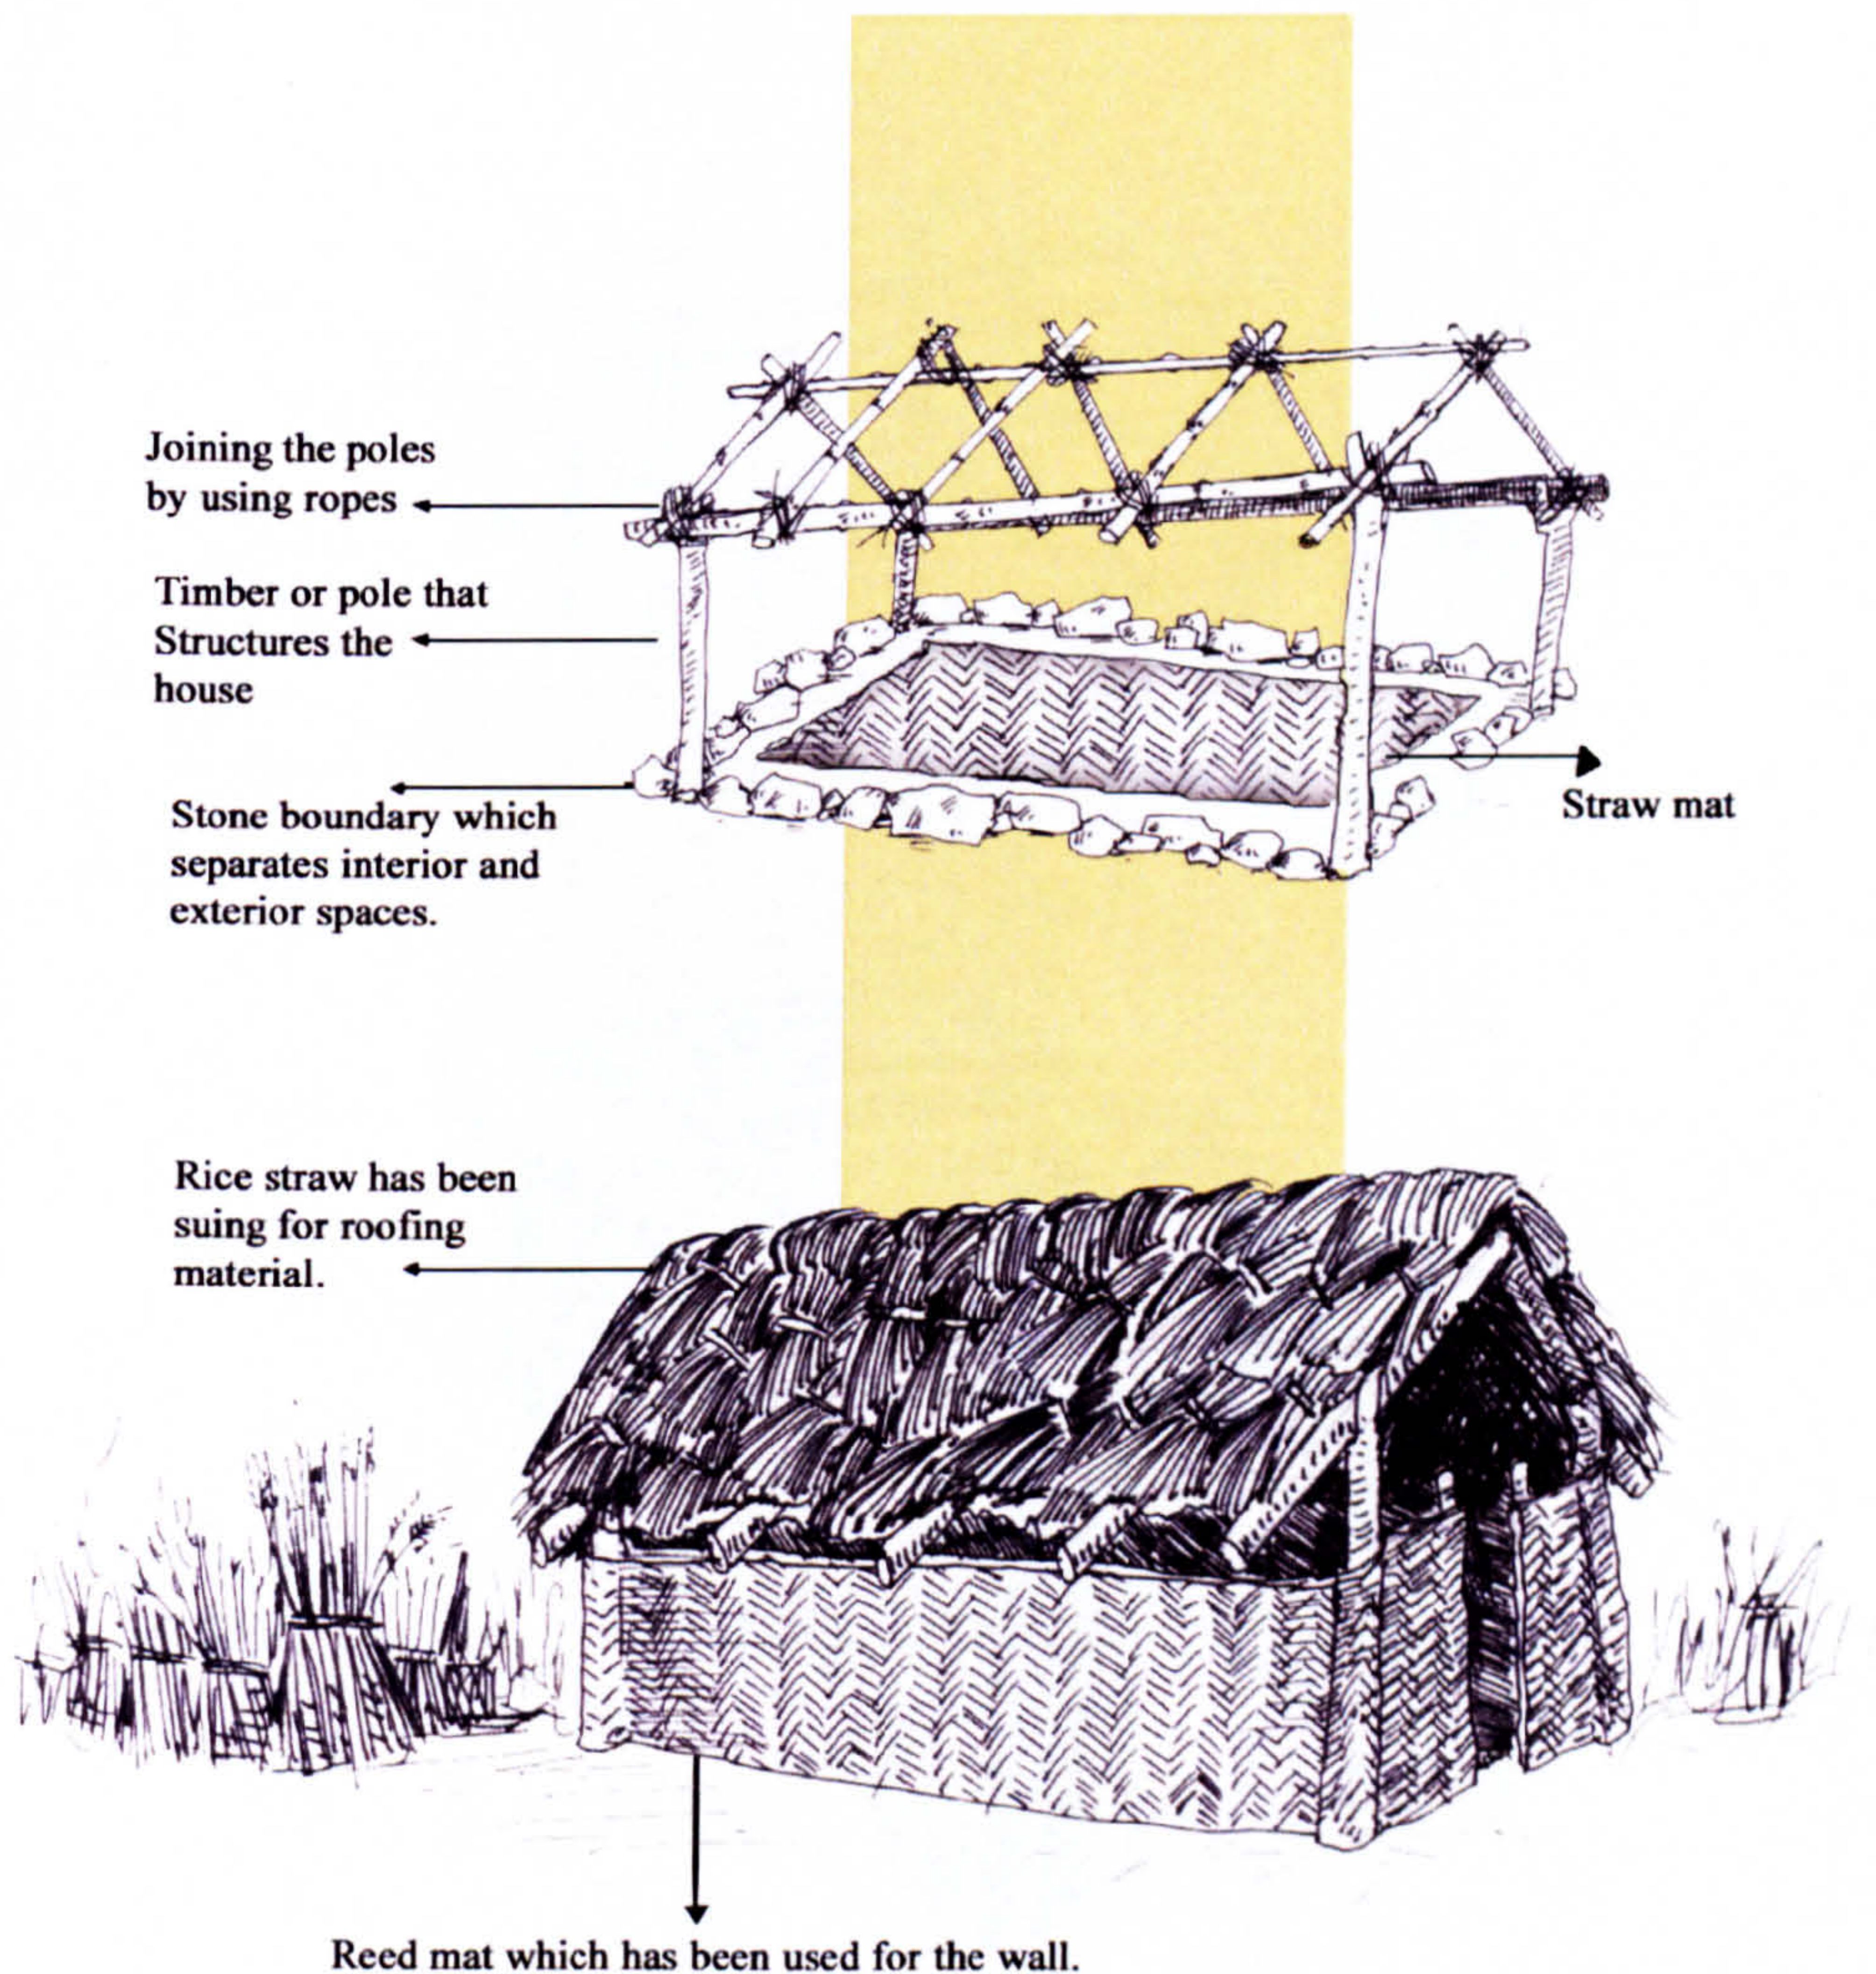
Drawing illustrating the structure of a straw house in Baluchistan. It shows the traditional way of using round poles and rope for joining. This temporary house is used by semi-nomadic people in the rural area of Jacobabad. Source: Author
